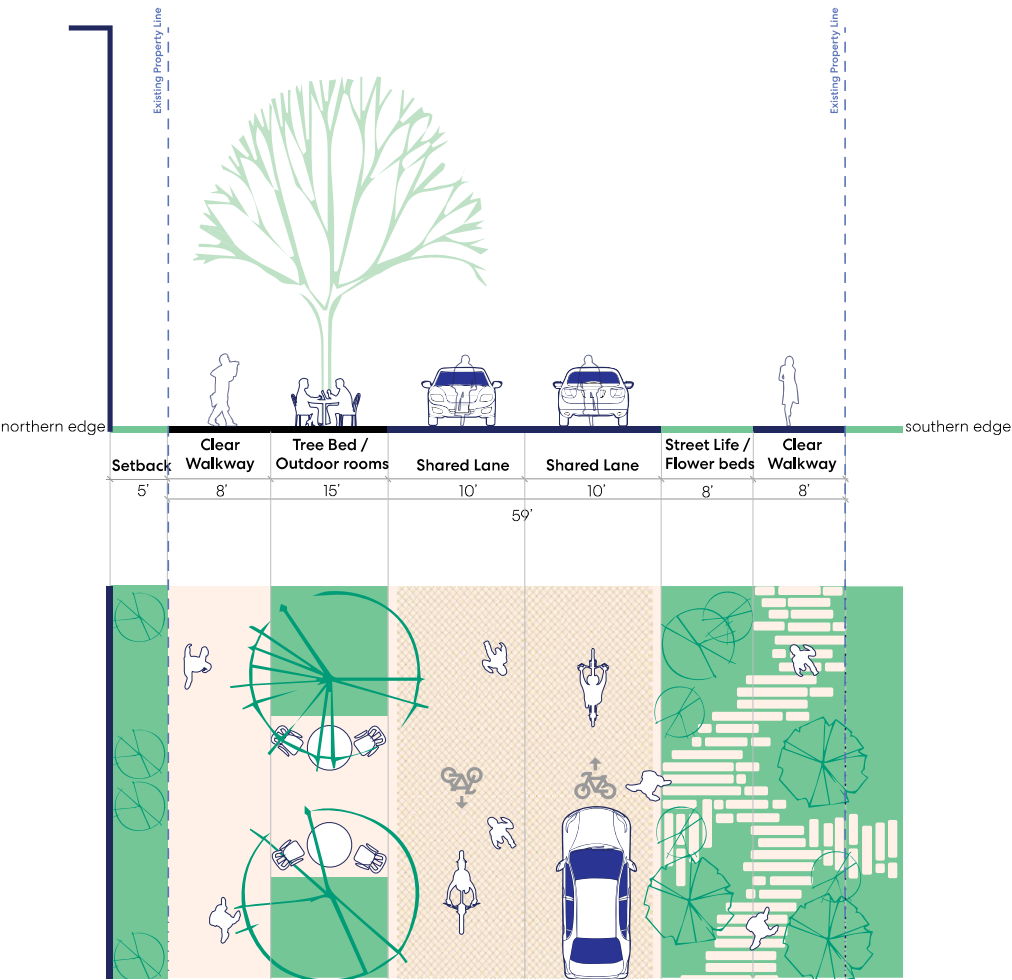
Typical Portage Avenue section between Park Boulevard and Ash Street
